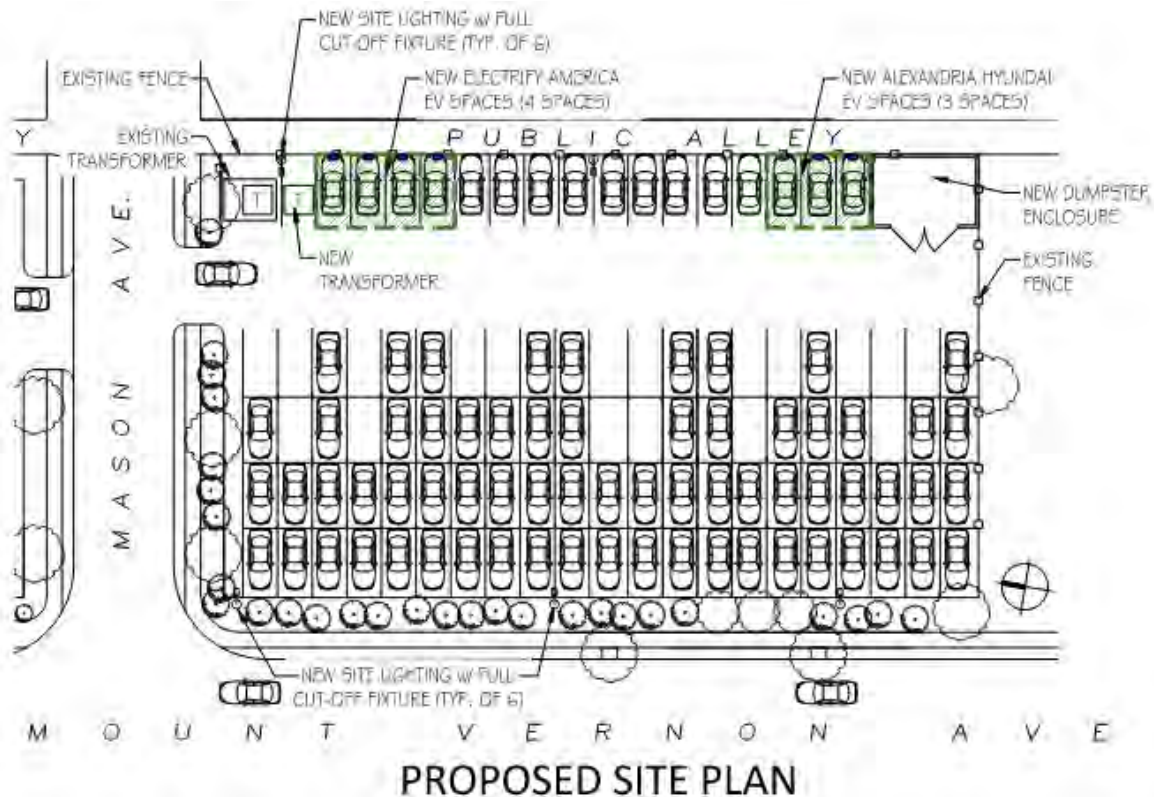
1605-1611 Mount Vernon Avenue proposed site changes
